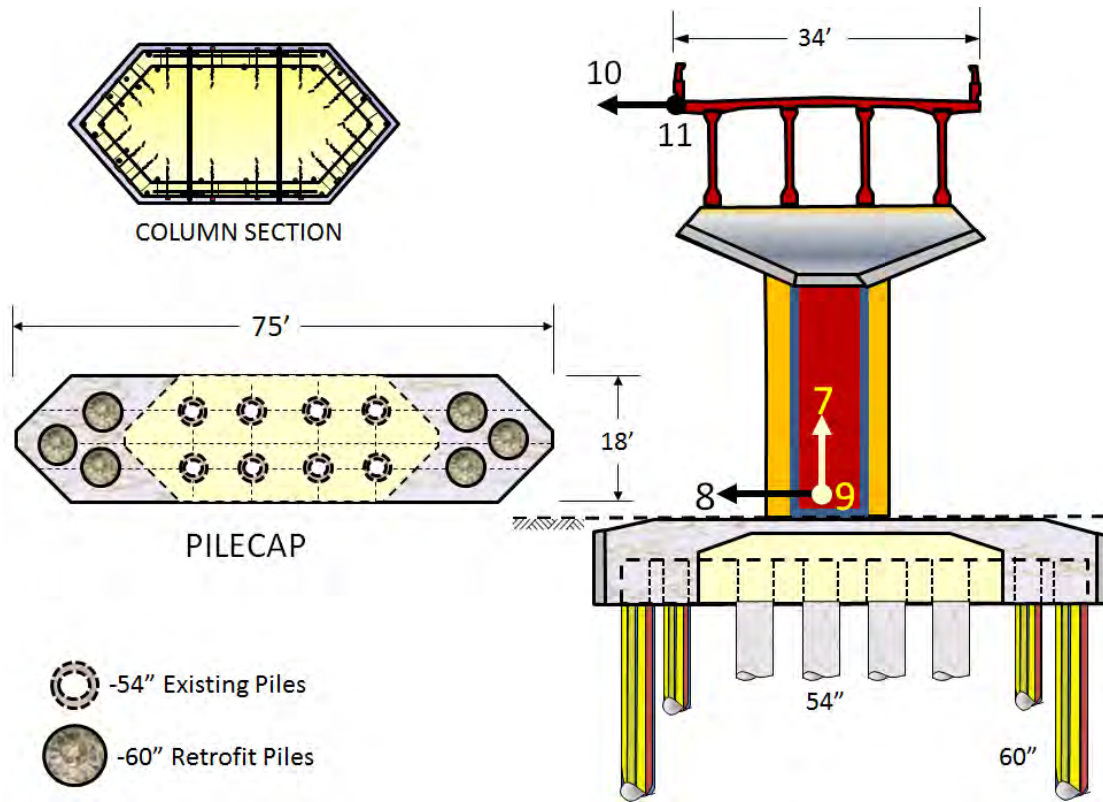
Pier 8 and its seismic instrumentation layout and the bridge retrofit.
